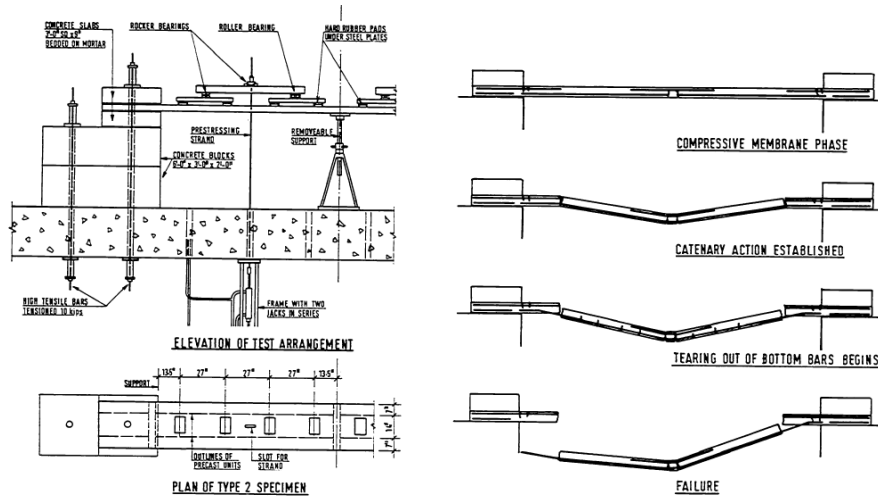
Catenary action tests of precast floor strips (Regan 1975)
